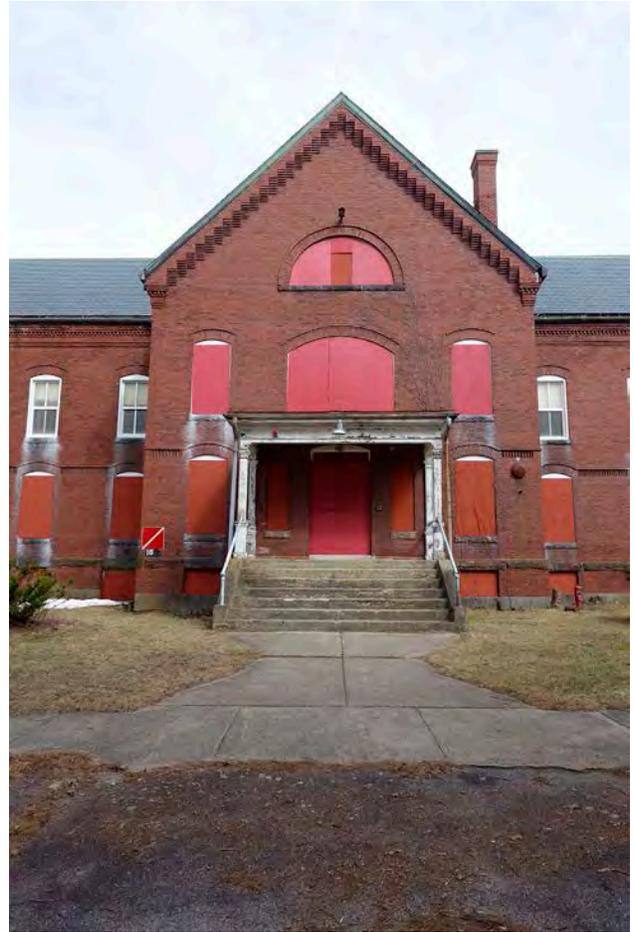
Entries are marked by brick eave detail and wood frame entry porches.
